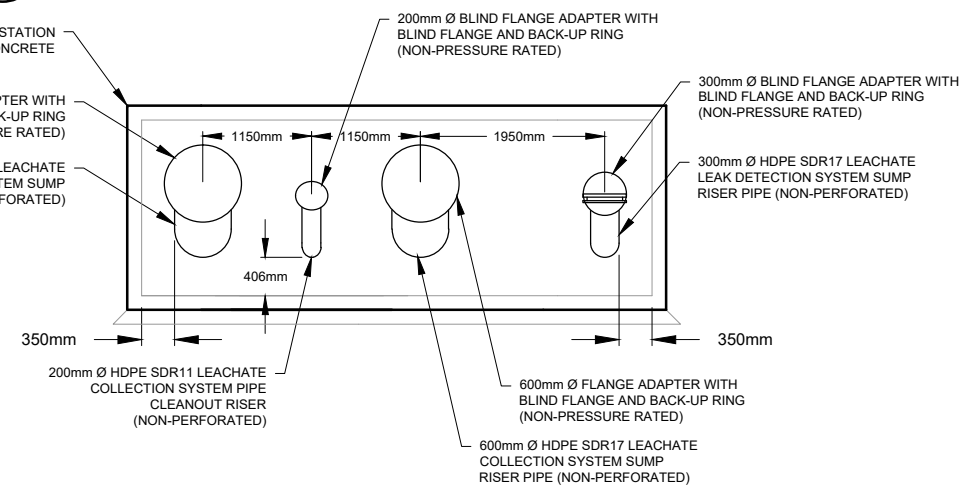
LEACHATE COLLECTION SYSTEM TOE DRAIN/ LEACHATE COLLECTION SYSTEM PIPE
